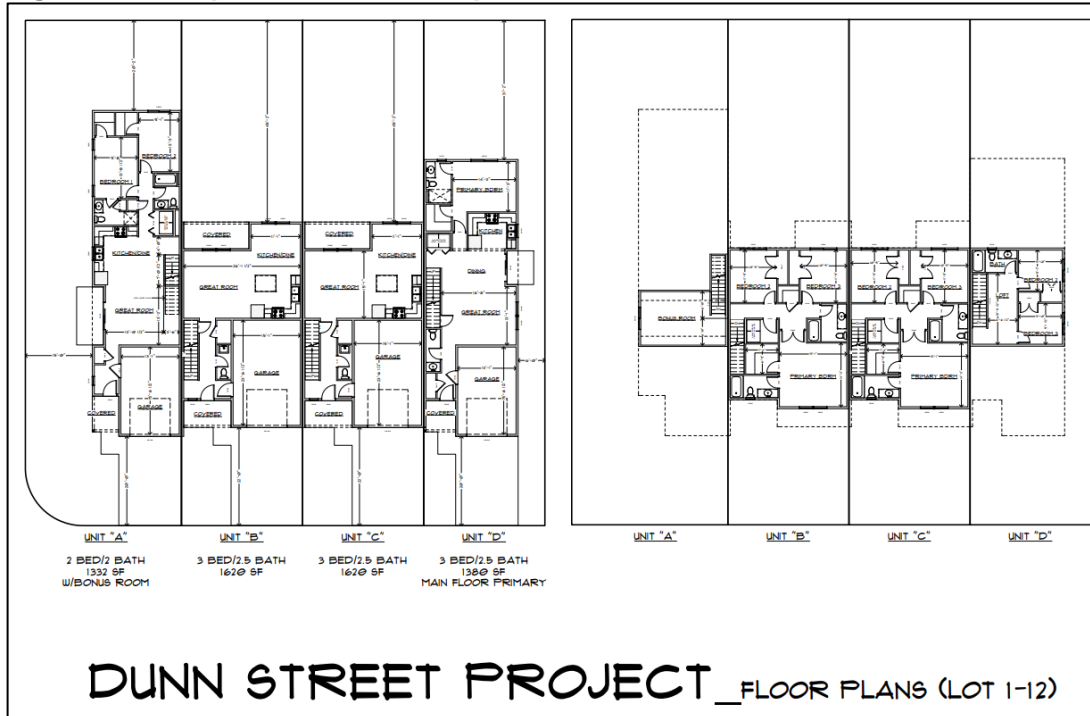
Proposed Plan – Floorplans and Elevations, 1-12
